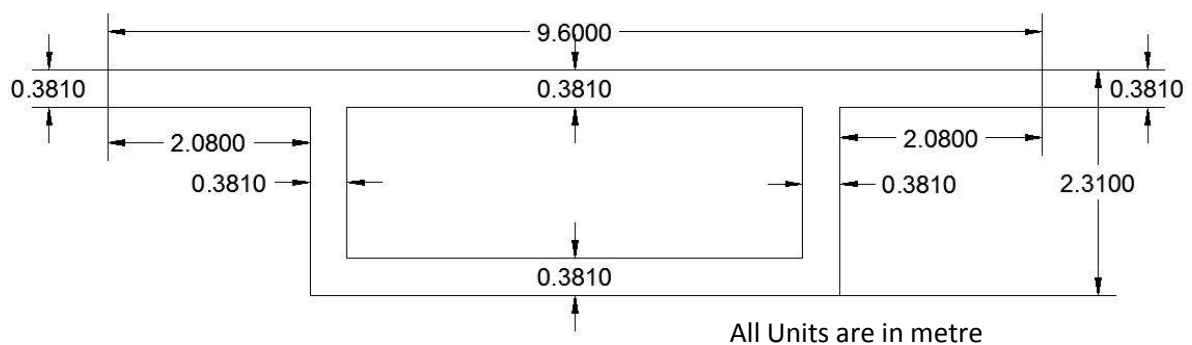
Cross Section of Simply Supported Box Girder Bridge considered for study
